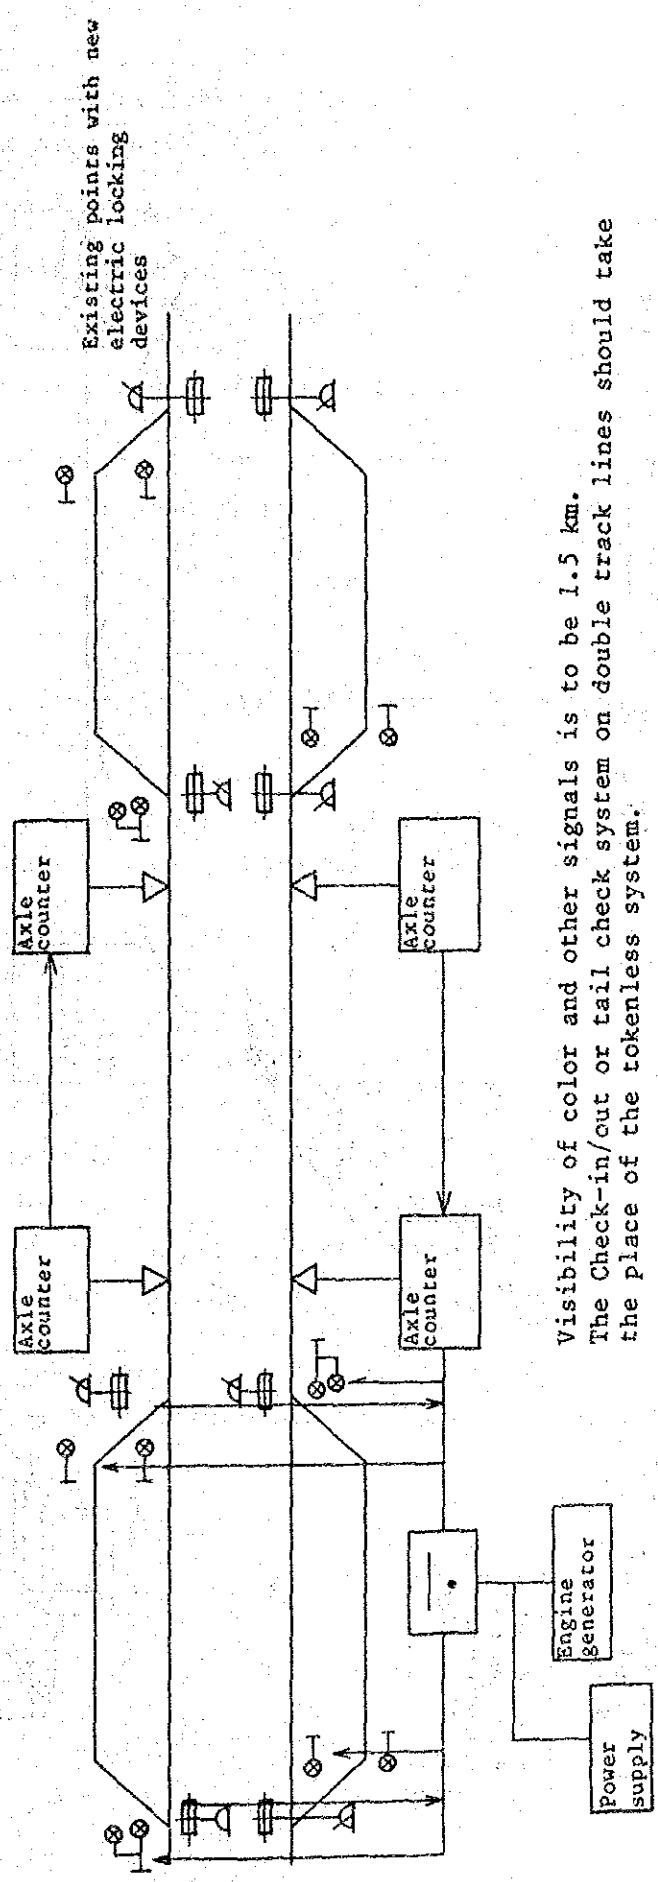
General Drawing (Single track line) (Plan A, B)
